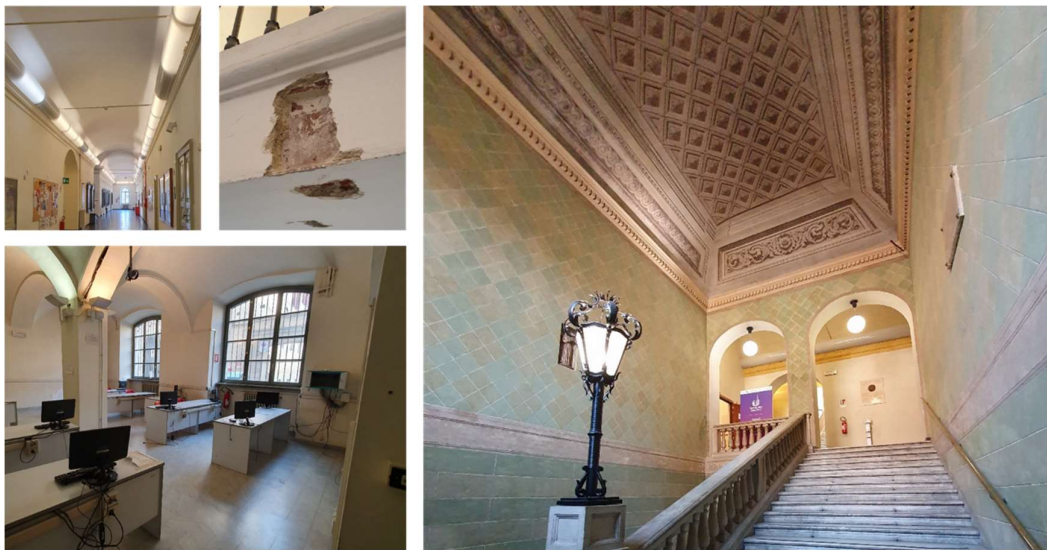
Internal halls of Palazzo Campana and localized damage below a slab
